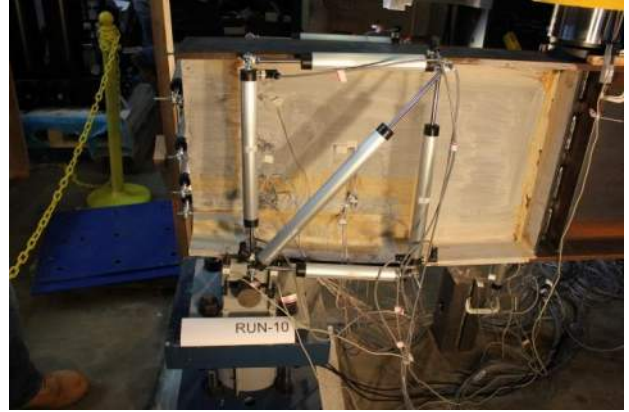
Damaged Girder Right: +1.00 in
